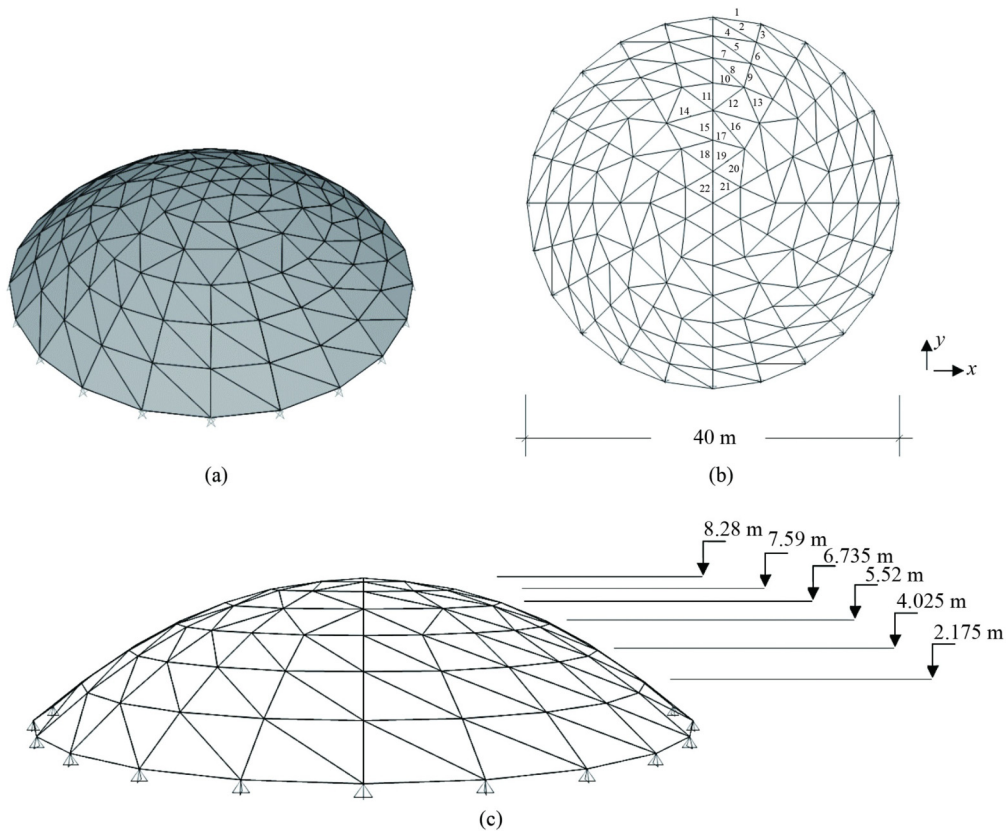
354-bar spatial steel dome structure. (a) 3D view; (b) top view and member grouping; (c) elevation view.
